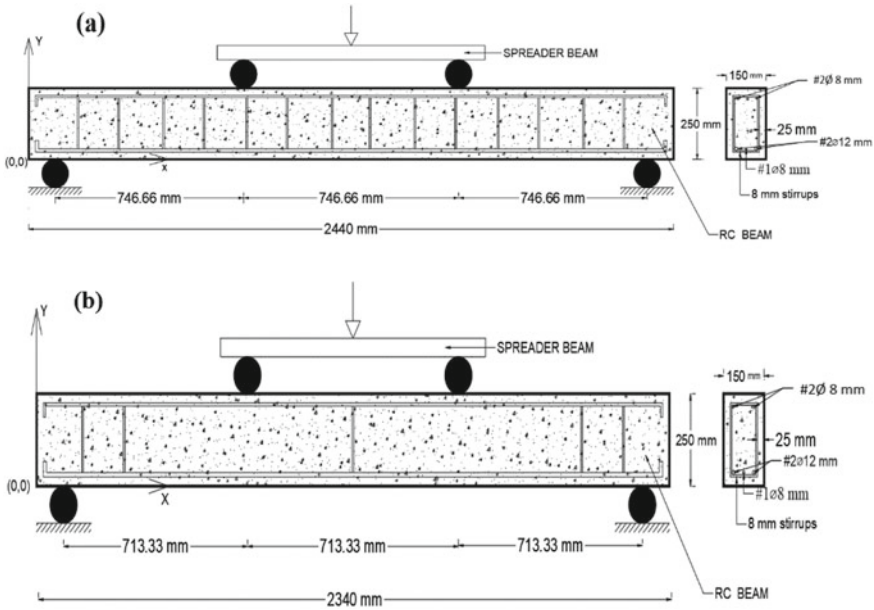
Schematic representation of geometry and reinforcement details in RC beams a with shear stirrups b with no shear stirrups
